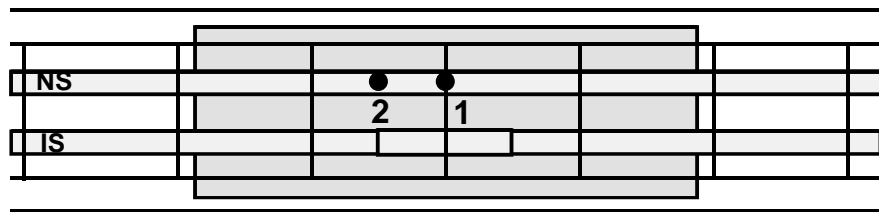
Invasive Inspection Locations, Specimen 3.3
